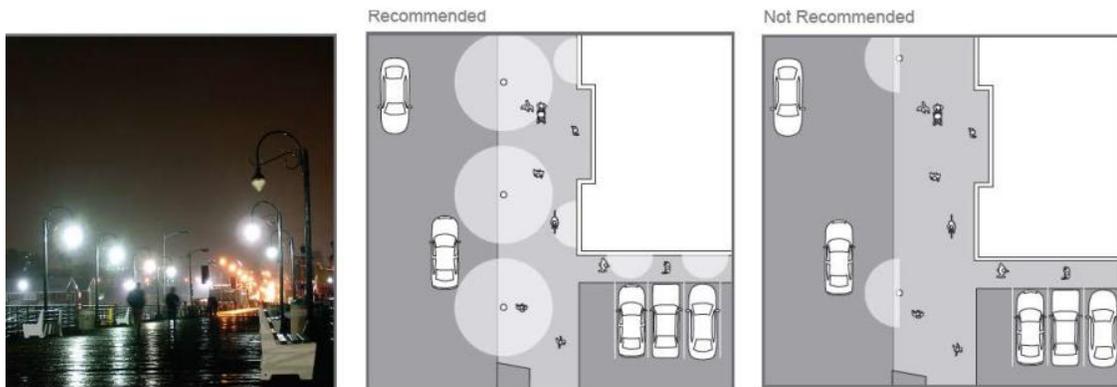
Parking areas and sidewalks illumination, (LA-Walkability, 2008)
